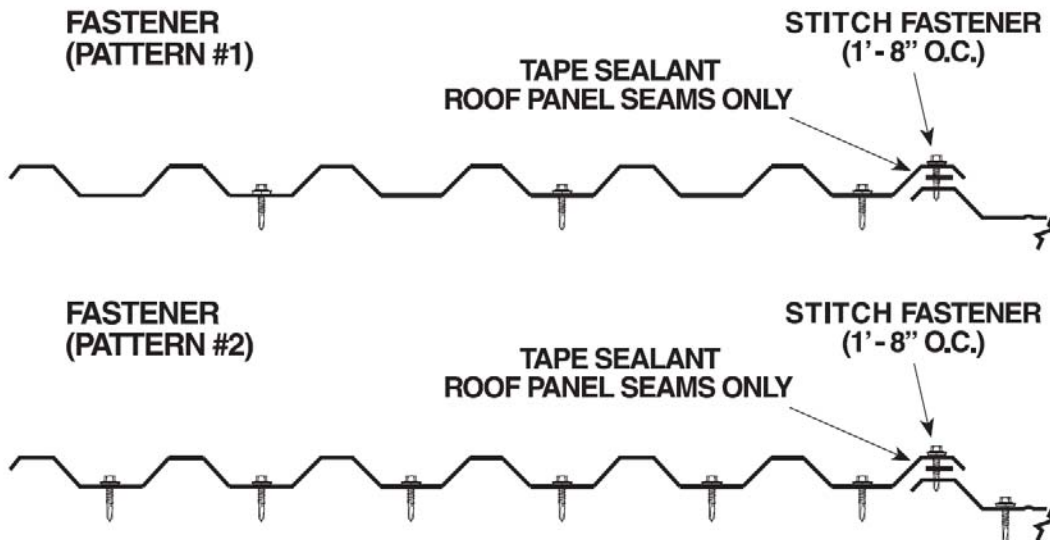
TYPICAL FRAMING AND STITCH FASTENER PATTERNS
